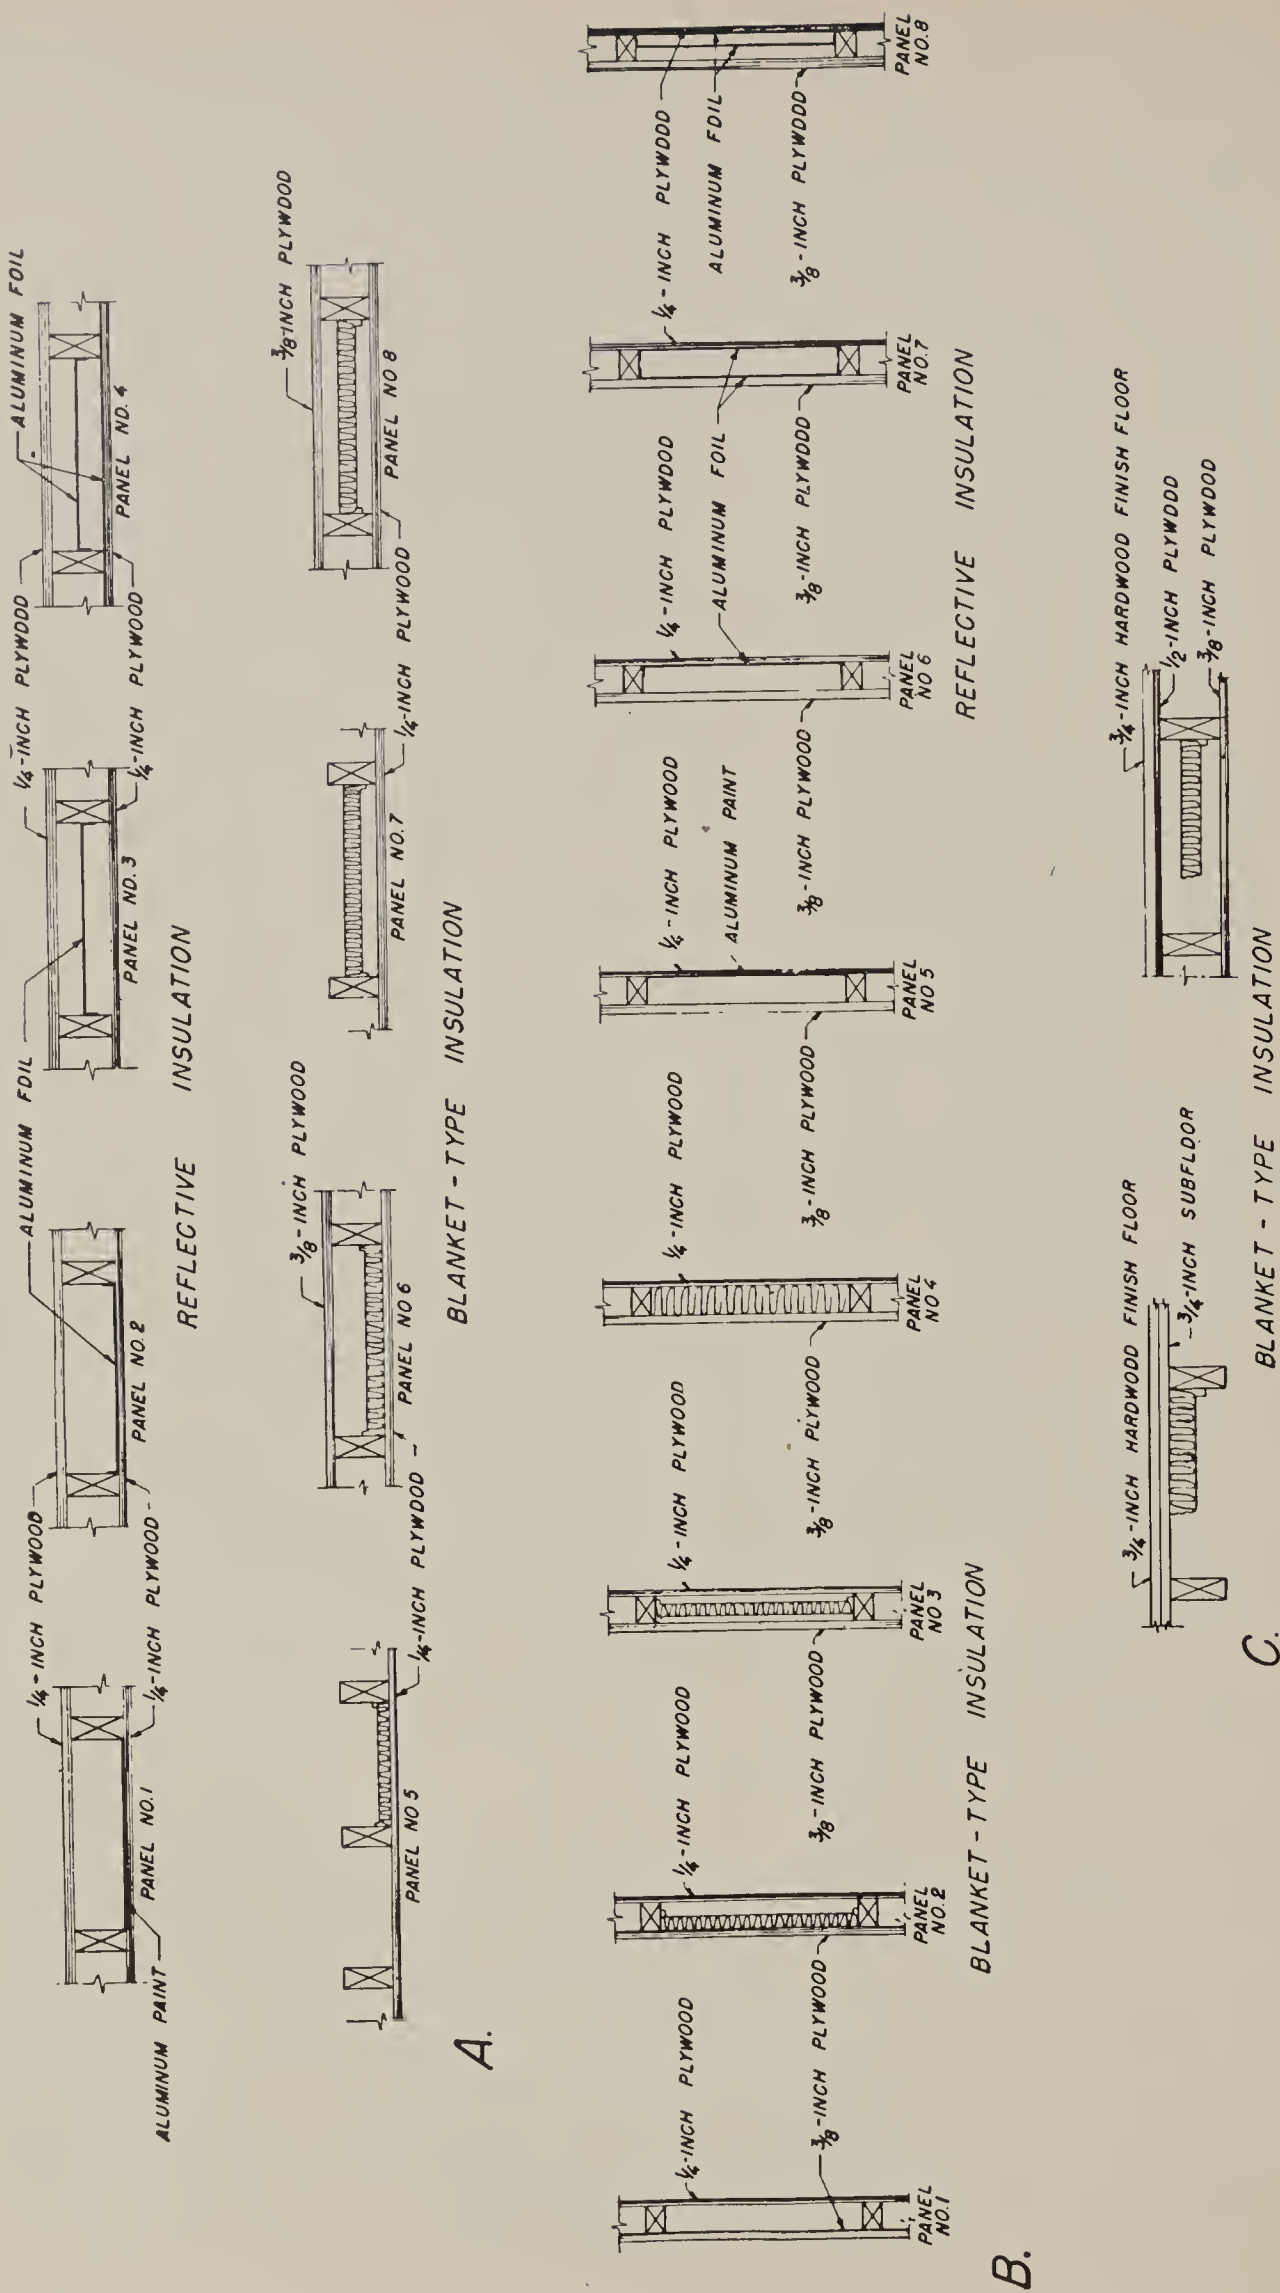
Various test constructions typical of prefabricated ceiling, wall, and floor panels with different types and amounts of insulation to compare their relative insulating effectiveness (tables 8-1, 8-2, and 8-3 give U values for each construction shown). A, eight types of ceiling panel construction; panels Nos. 1 through 4 have reflective insulation, panels Nos. 5 through 8 blanket-type insulation. B, eight types of wall panel construction; panels Nos. 1 through 4 have reflective insulation, panels Nos. 5 through 8 blanket-type insulation. C, two types of floor construction with blanket-type insulation.
